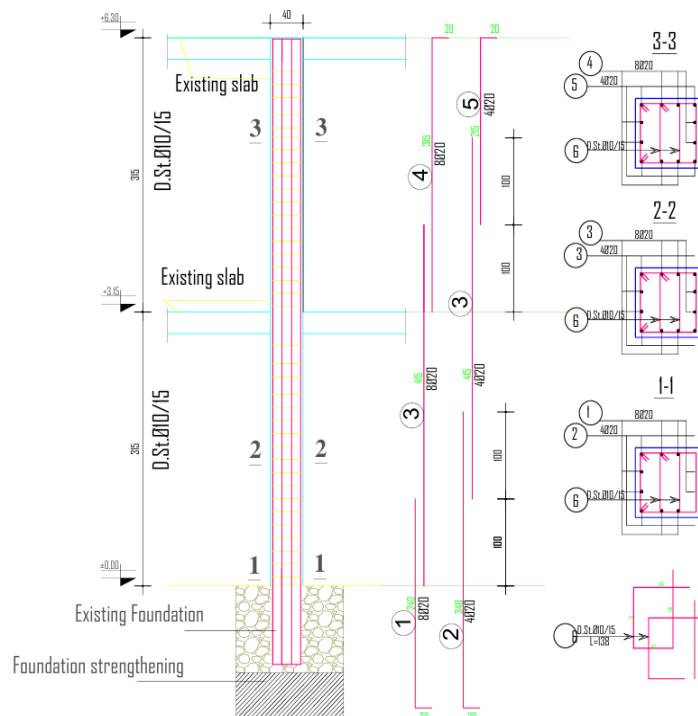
Added perimeter reinforcing concrete columns implemented on building 7
